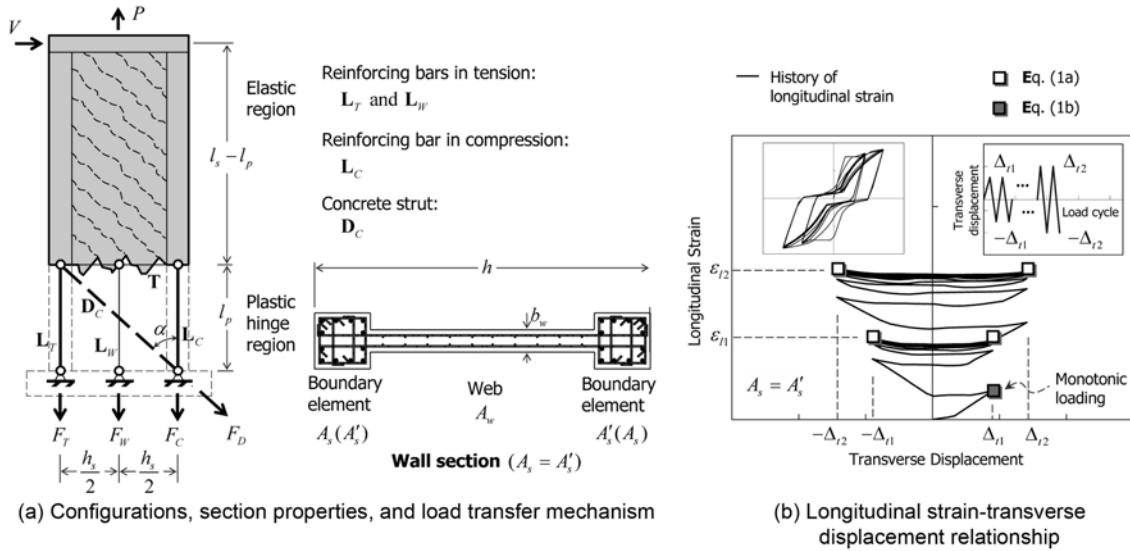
Evaluation of longitudinal elongation of slender reinforced concrete walls
